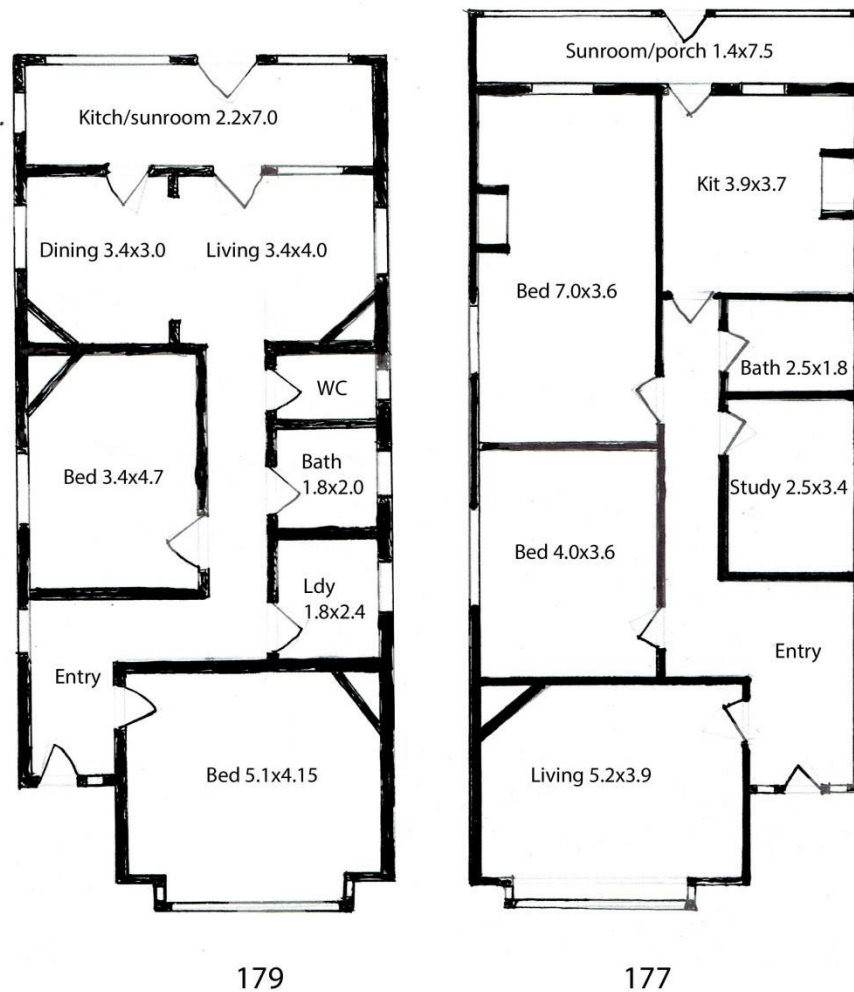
Floor plans of 177-179 Campbell Street (street to bottom of plan, note doors and windows not necessarily to scale).
